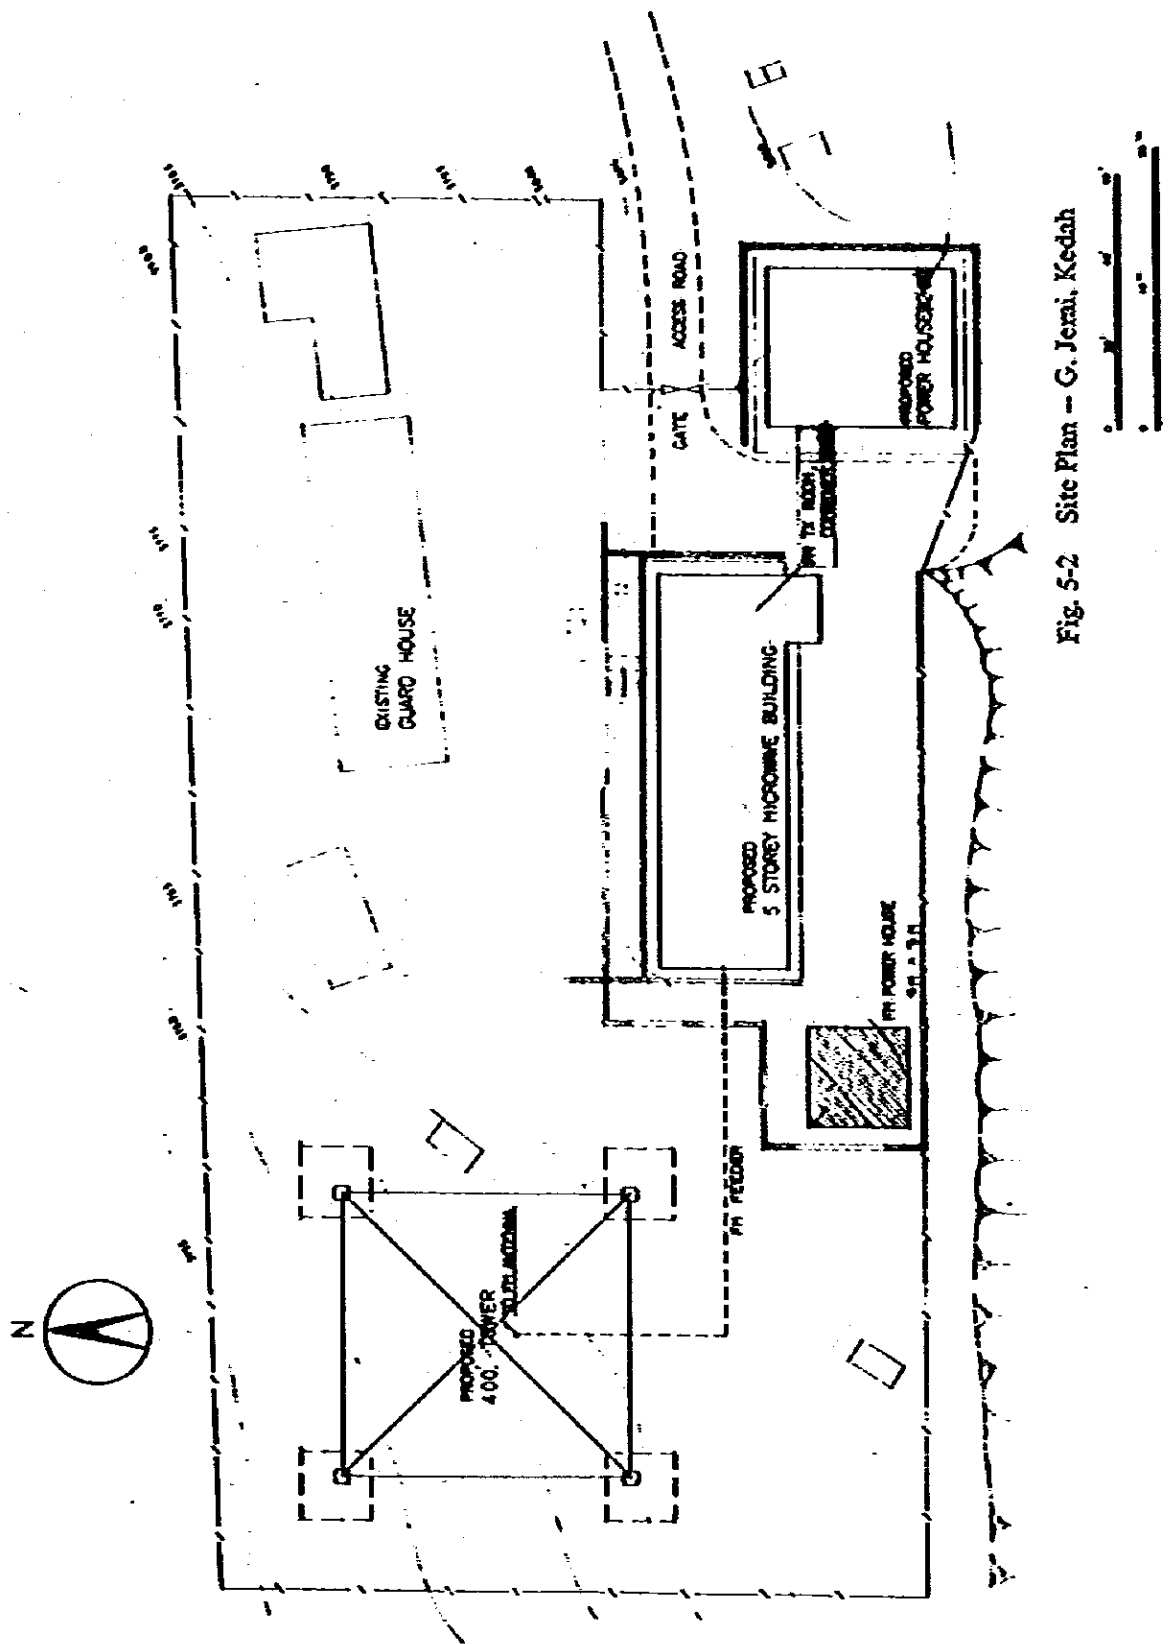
Site Plan -- G. Jerai, Kedah
